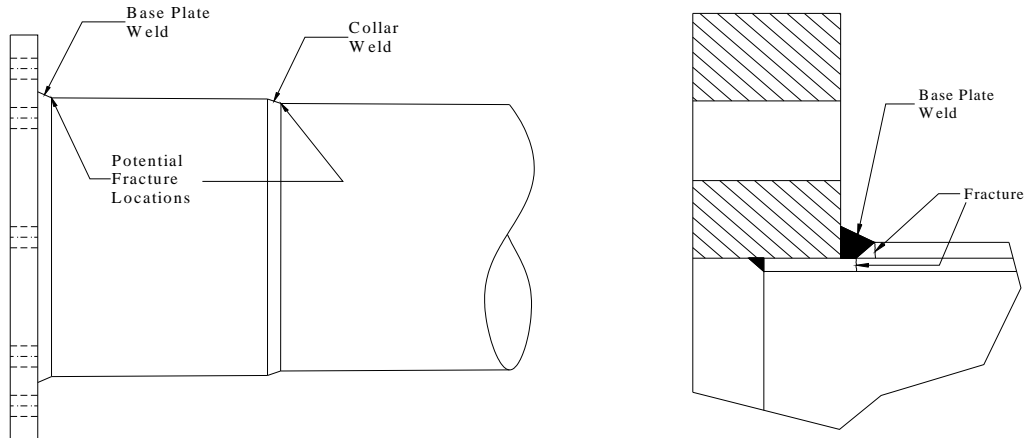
Potential Fracture Locations and Weld Detail for SEC Connection
